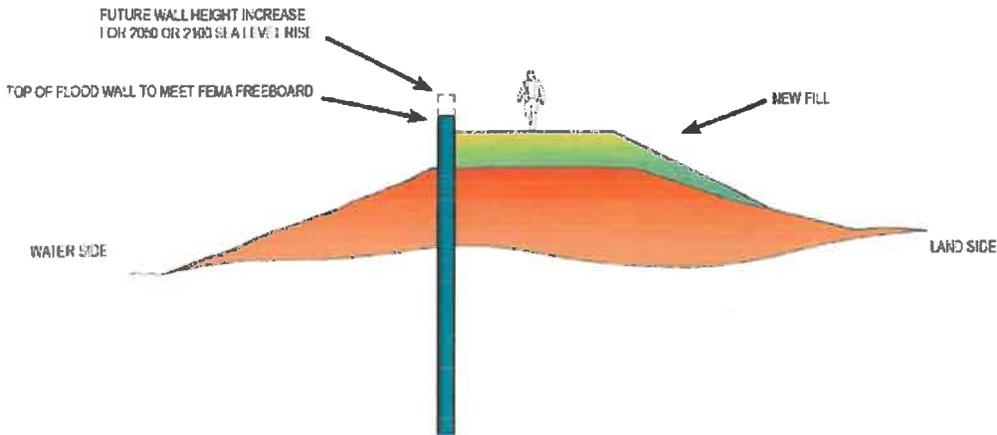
Typical Sheet Pile Floodwall Levee Improvement Type
